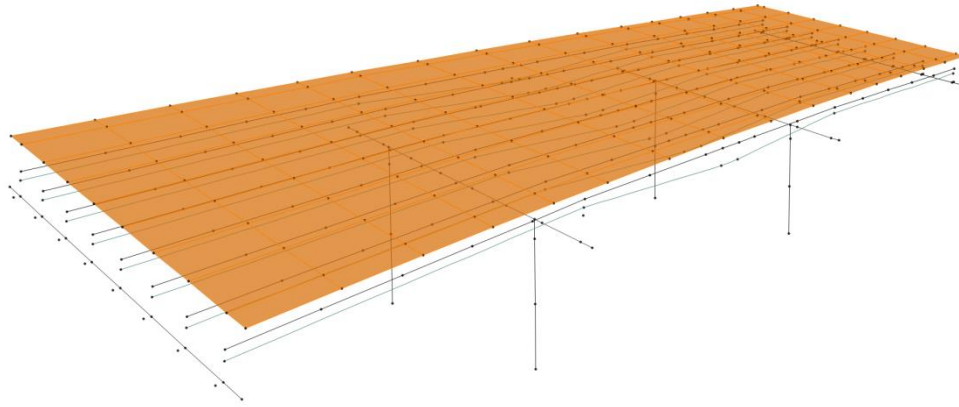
SAP2000 Bridge Model with Bent Cap and Abutment Sections
